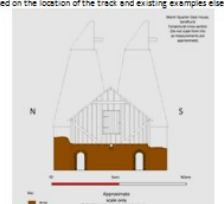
Conjectural cross section with timber-framed first floor Storage.
